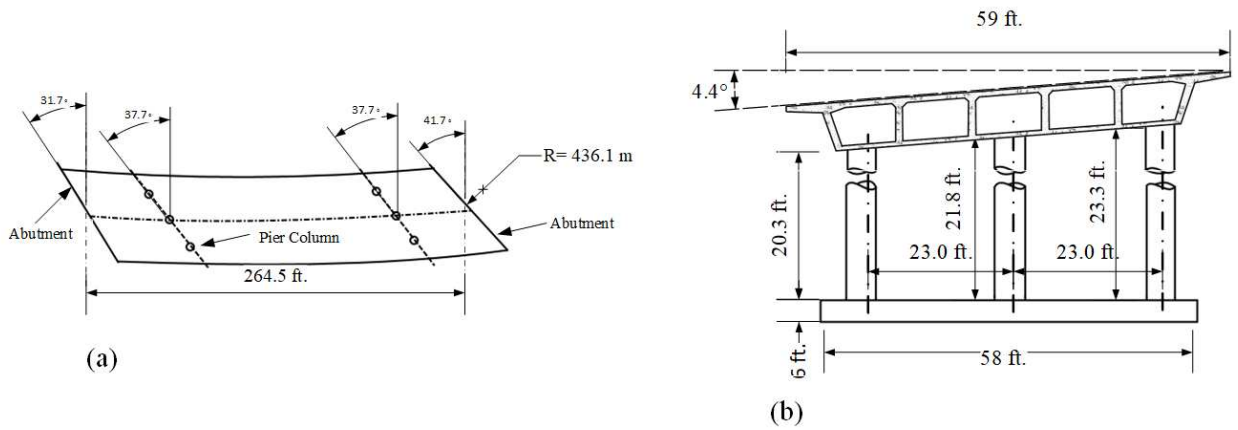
Geometries of prototype bridge: (a) top view of girders and (b) elevation view
